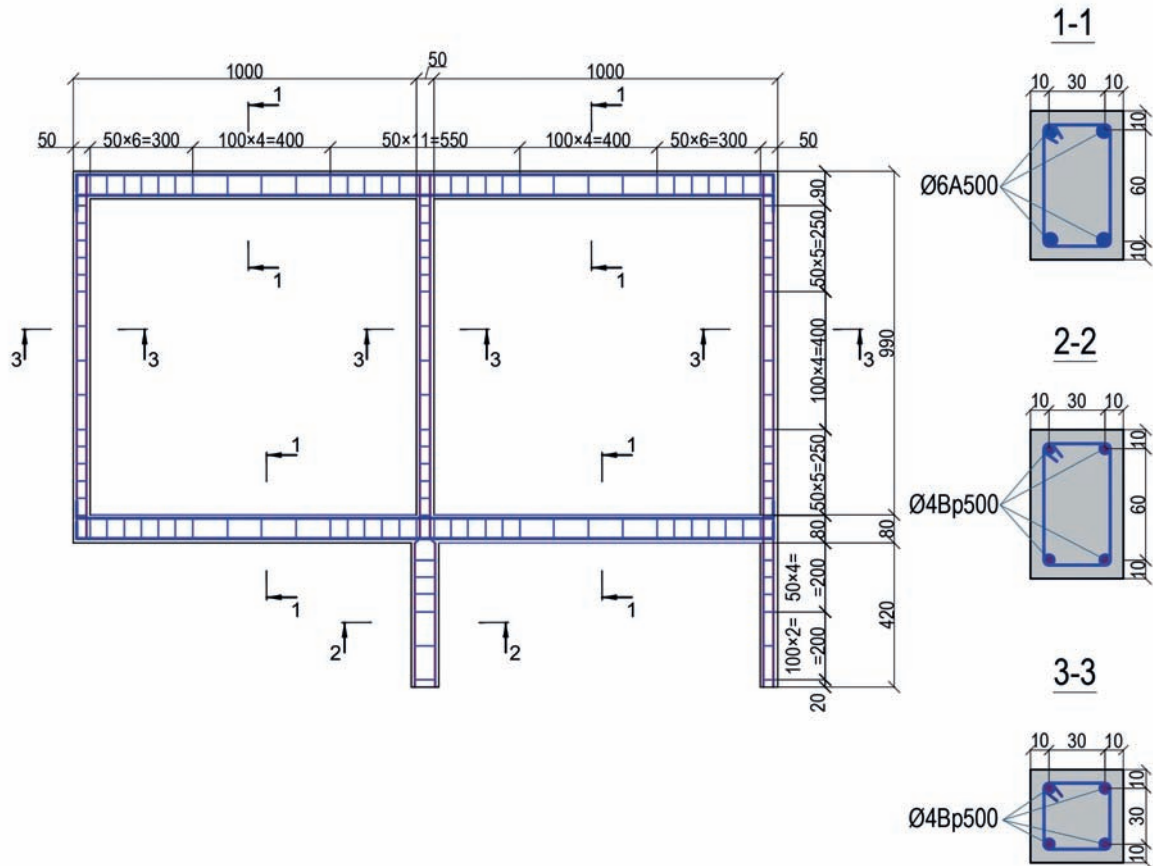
Design of the reinforced concrete frame and its reinforcement scheme
